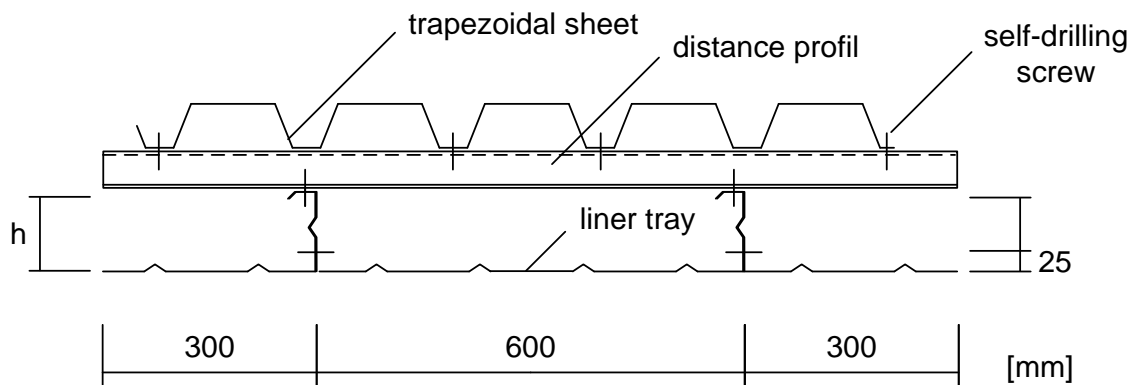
Cross section of the test specimens for double span positive bending tests (DSP)
